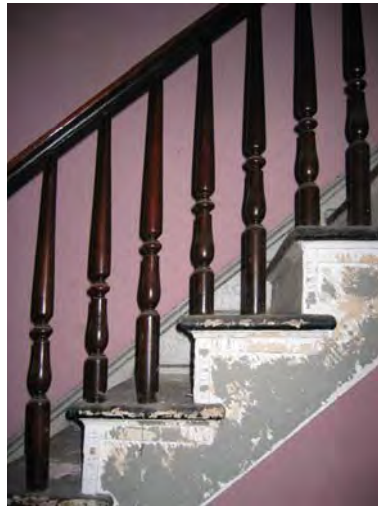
Balustrade and riser at second floor stair. (Photo: BBB, 2007)
